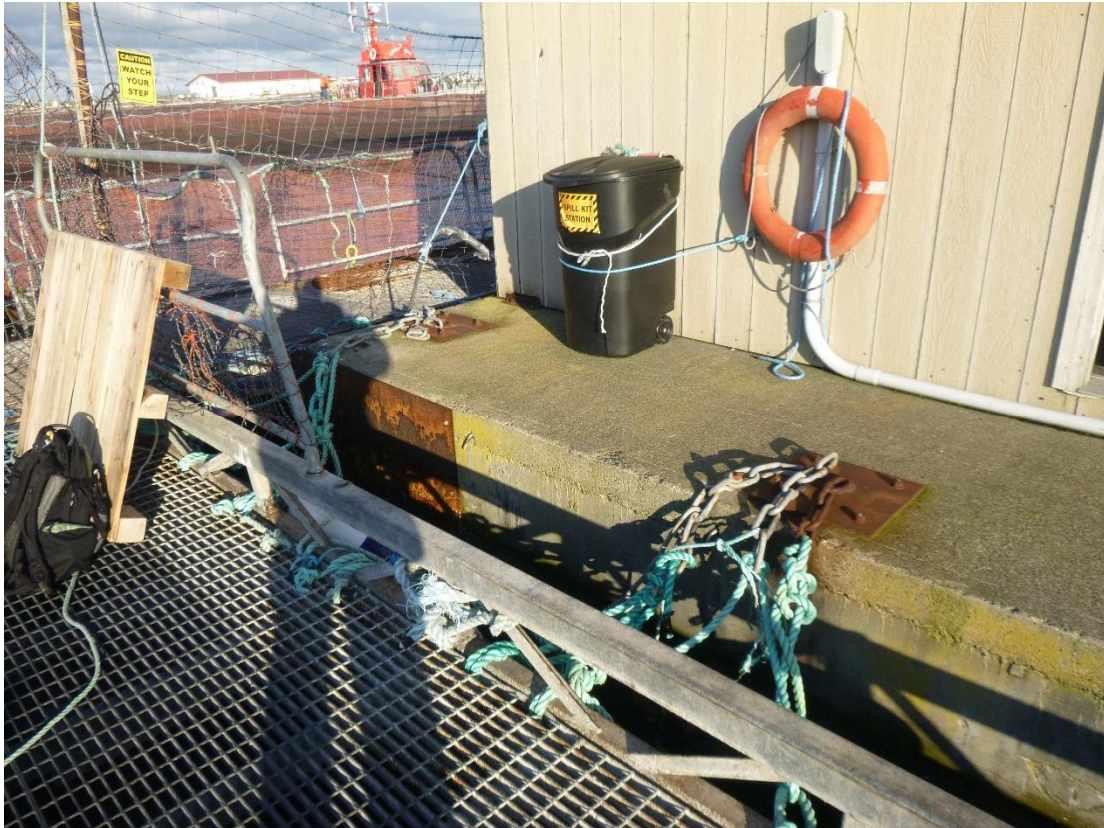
West Face of Office and Gen-set Barge – Looking Northeast
